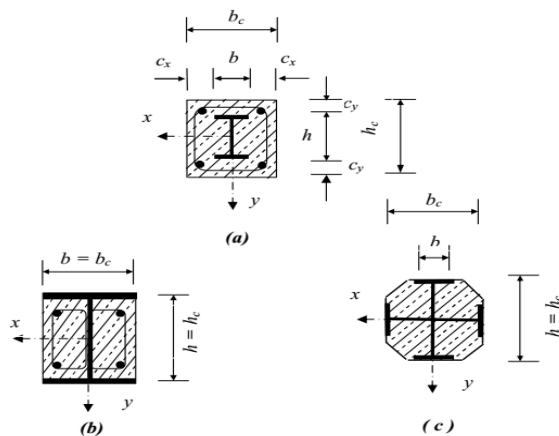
Typical Cross - Sections of Fully and Partially Concrete Encased Columns
